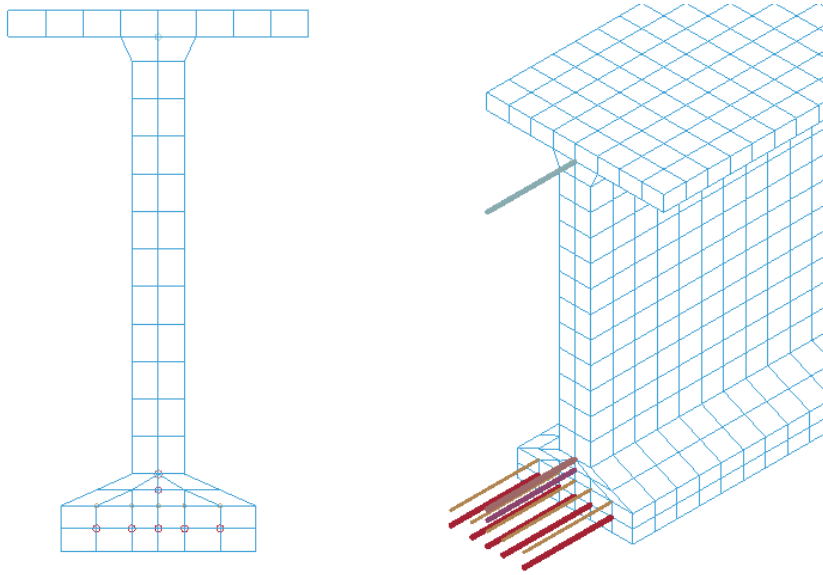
Zoom-In View of Strands at the Mid-Span of The Girder of Archetype 4 Bridge.
